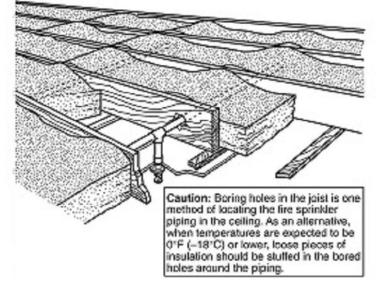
(c) Insulation Recommendations — Arrangement 3.
